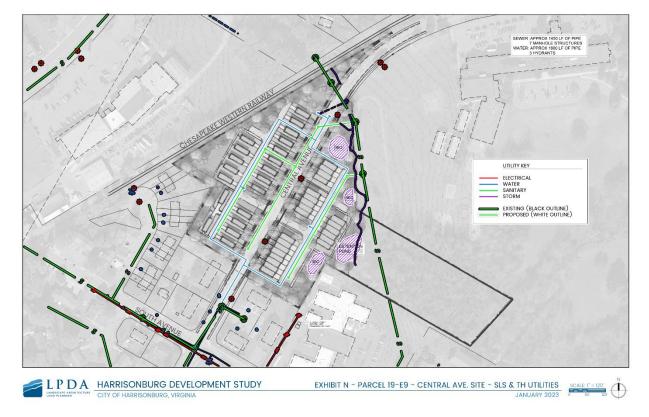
Exhibit N: Central Avenue townhomes and small lot single SMW/Utility plan
